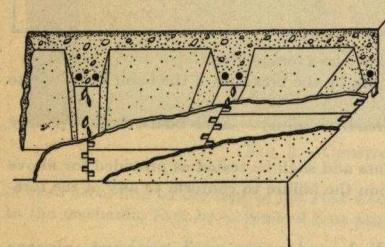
Showing application of Sackett soffit ceiling on reinforced concrete construction. Note how flanges of steel clips imbedded in concrete joists are bent each way holding Sackett board in place.
